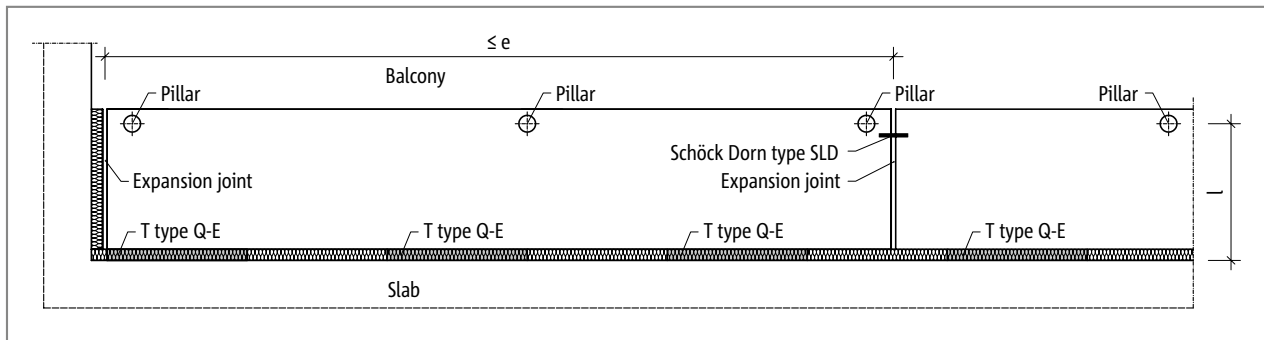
Schöck Isokorb® T type Q-E: Expansion joint spacing
